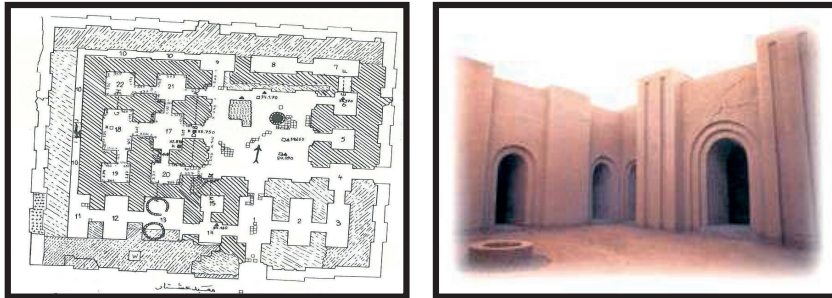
Plan of Ishtar Temple and photo of inside temple [1,25]
